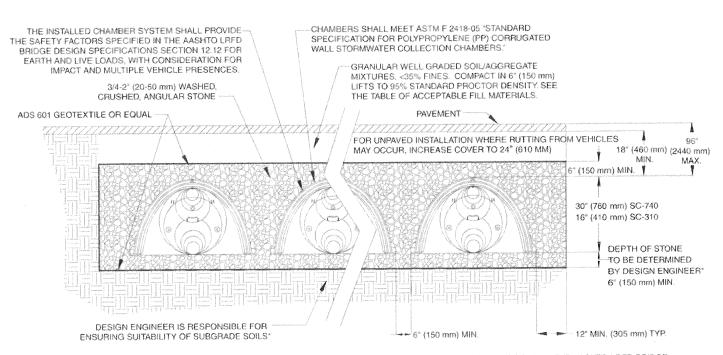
Figure G. Section through Parking Lot Storage Area (Schematic) (Not a Standard Plan)
